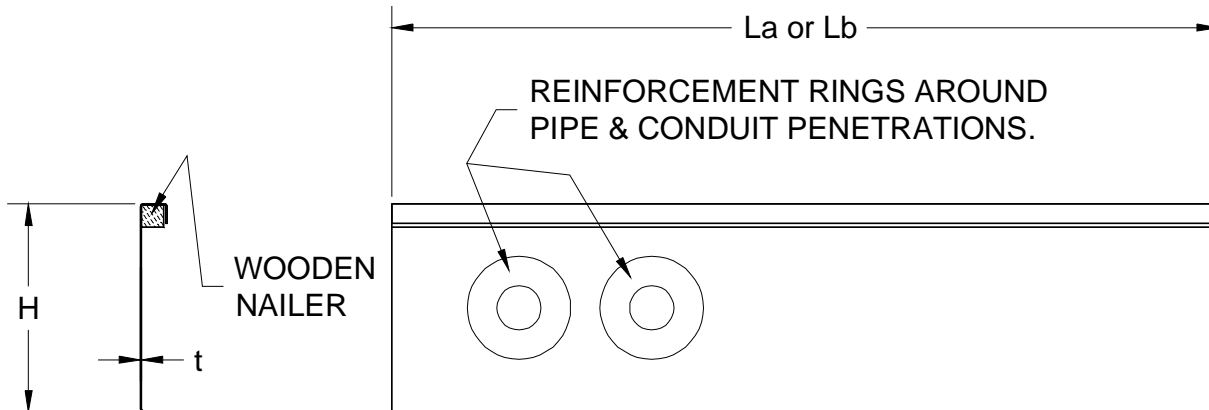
; Reinforcement of Piping/Conduit Penetrations
